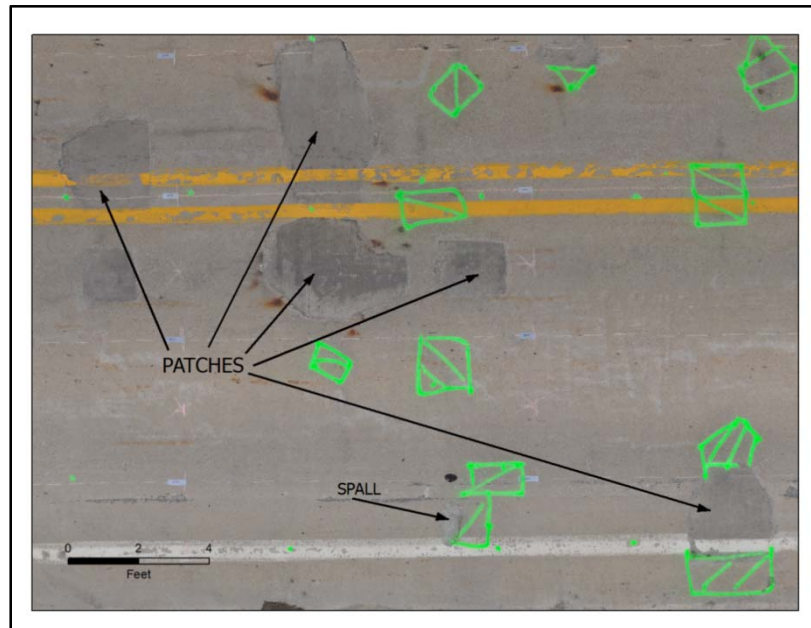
Section of the ortho-photo of the Willow Road bridge deck illustrating patches and a spall. The green pavement markings outline areas of subsurface delamination as determined by sounding performed by MDOT bridge inspectors with the hammer (rod) sounding technique.
